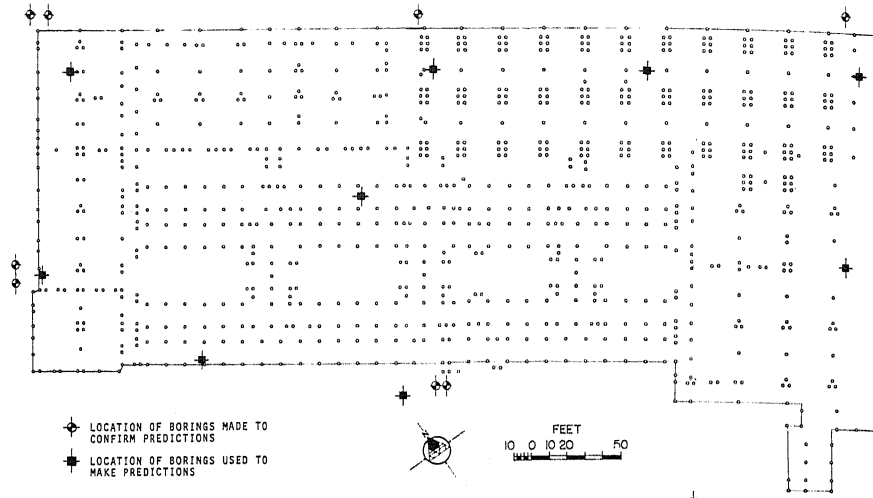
PILE LOCATION AND LAYOUT OF BORINGS FOR ORIGINAL HOSPITAL BUILDING.
